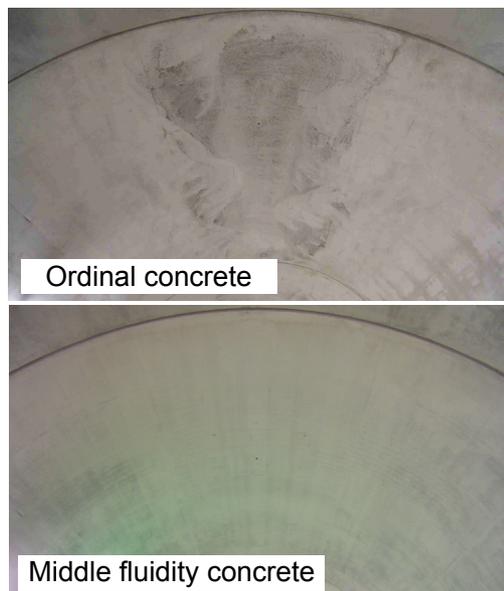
Surface of tunnel lining using ordinal and Middle fluidity concrete
